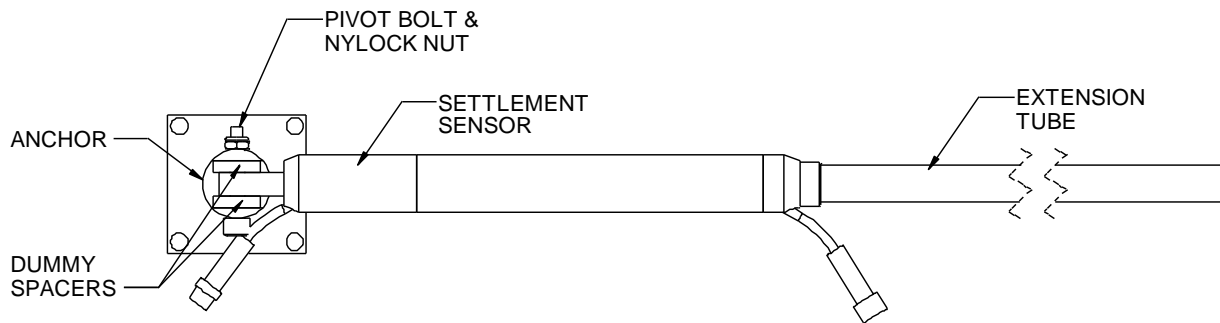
Connecting first set of Anchor Plate and Settlement Sensor
